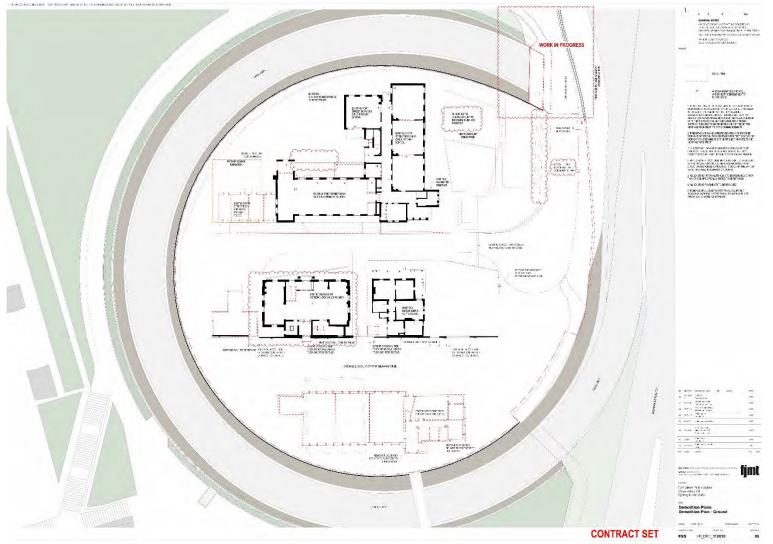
Demolition Plan – Ground. (Source: Lendlease, 2021)
